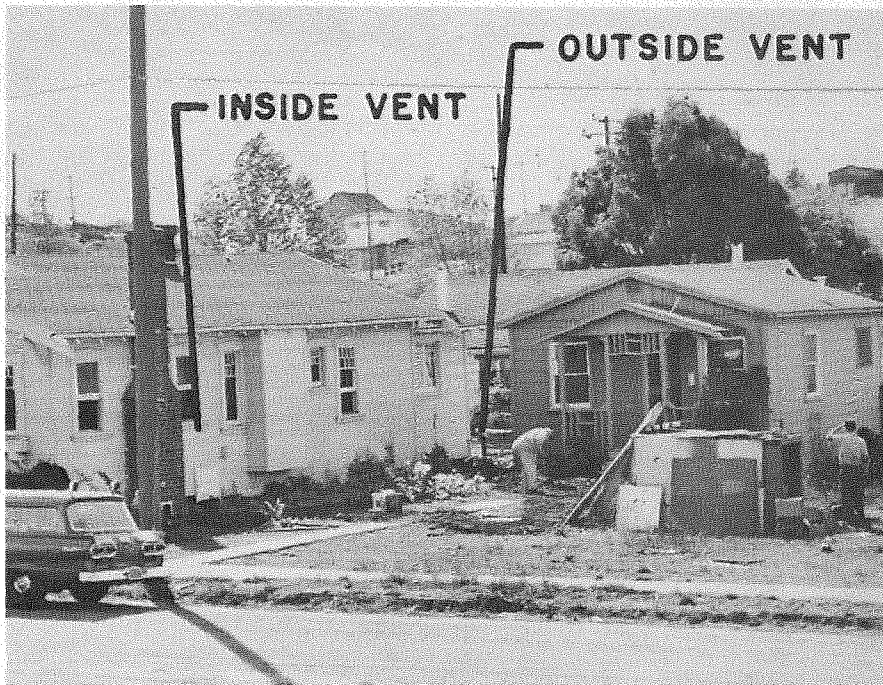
Two wood houses observed in Richmond Test No. 2. One vent was located in living room of left house, the other outdoors between the two houses.
